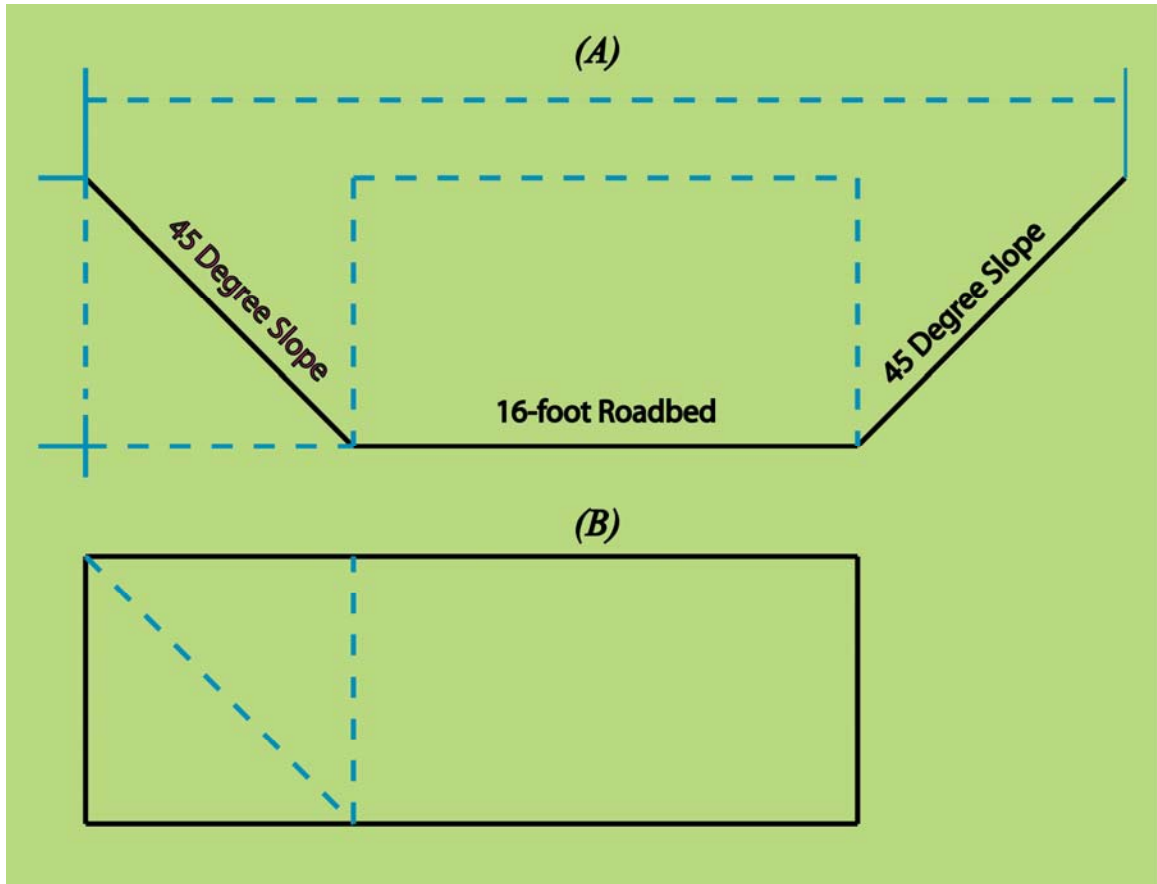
Walter Gwynn specified in his report on the survey of the Portsmouth & Roanoke Rail Road that excavations should have the roadbed at 13 to 16 feet wide and the angle of 45 degrees for the slopes (A). Fortunately, the angle of the area allows the cross-section to be calculated as a rectangle where the height multiplied by the height plus the width of the roadbed equals the area of the excavation into a level surface (B).
